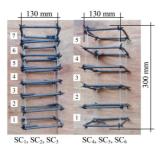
Details of test specimen stirrups: SC_1 - SC_3 , s_h = 36 mm; SC_4 - SC_6 , s_h = 52 mm
